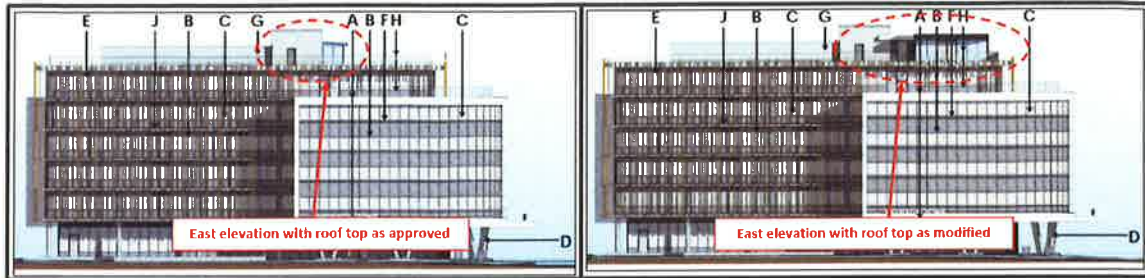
| Private hospital east elevation – external façade comparison – approved (left) and requested (right) (Source: Application documents)
